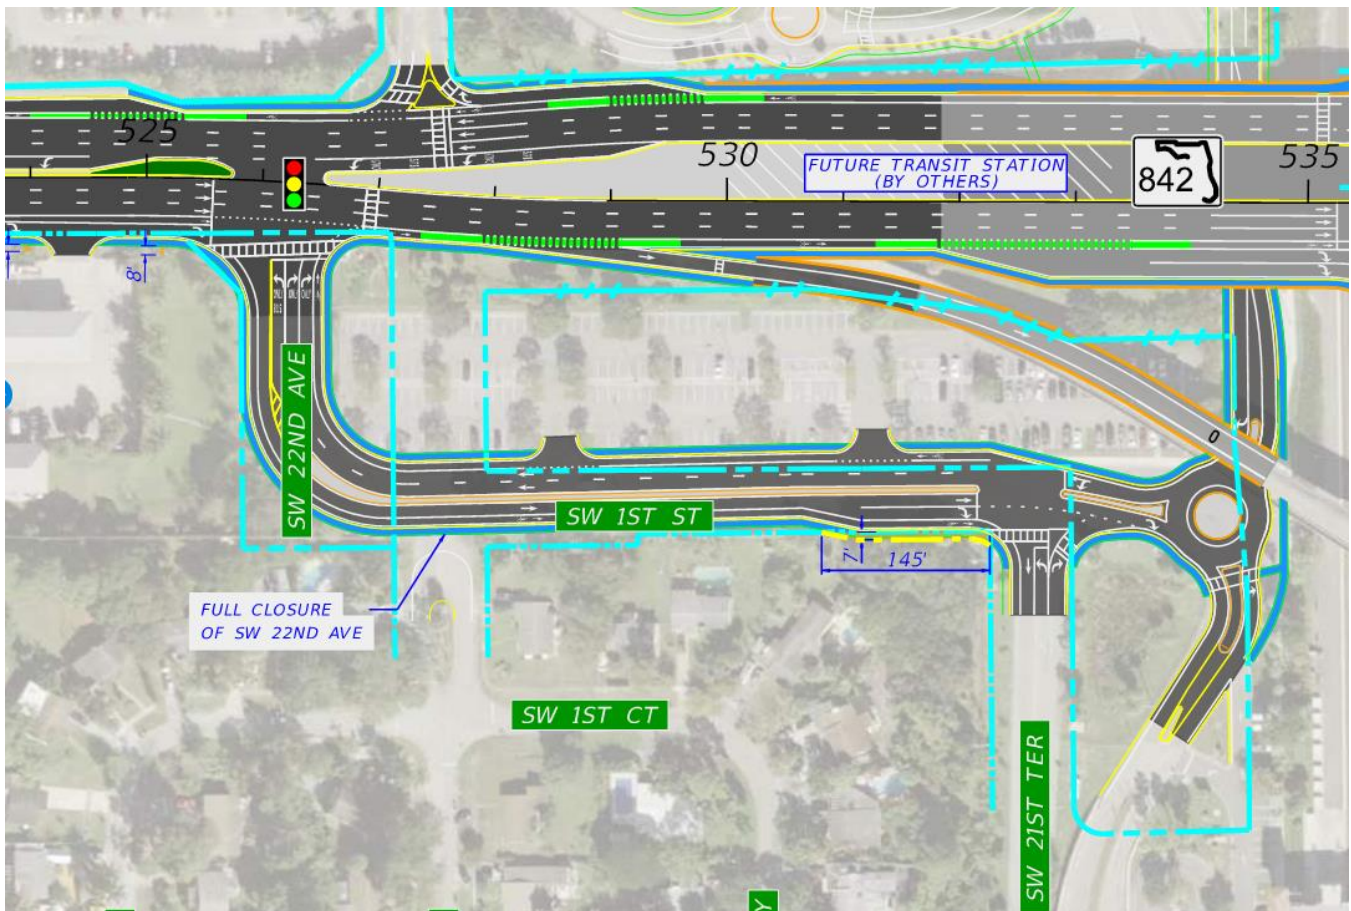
| SW 1<sup>st</sup> Street Alternative 1 – No-Build
